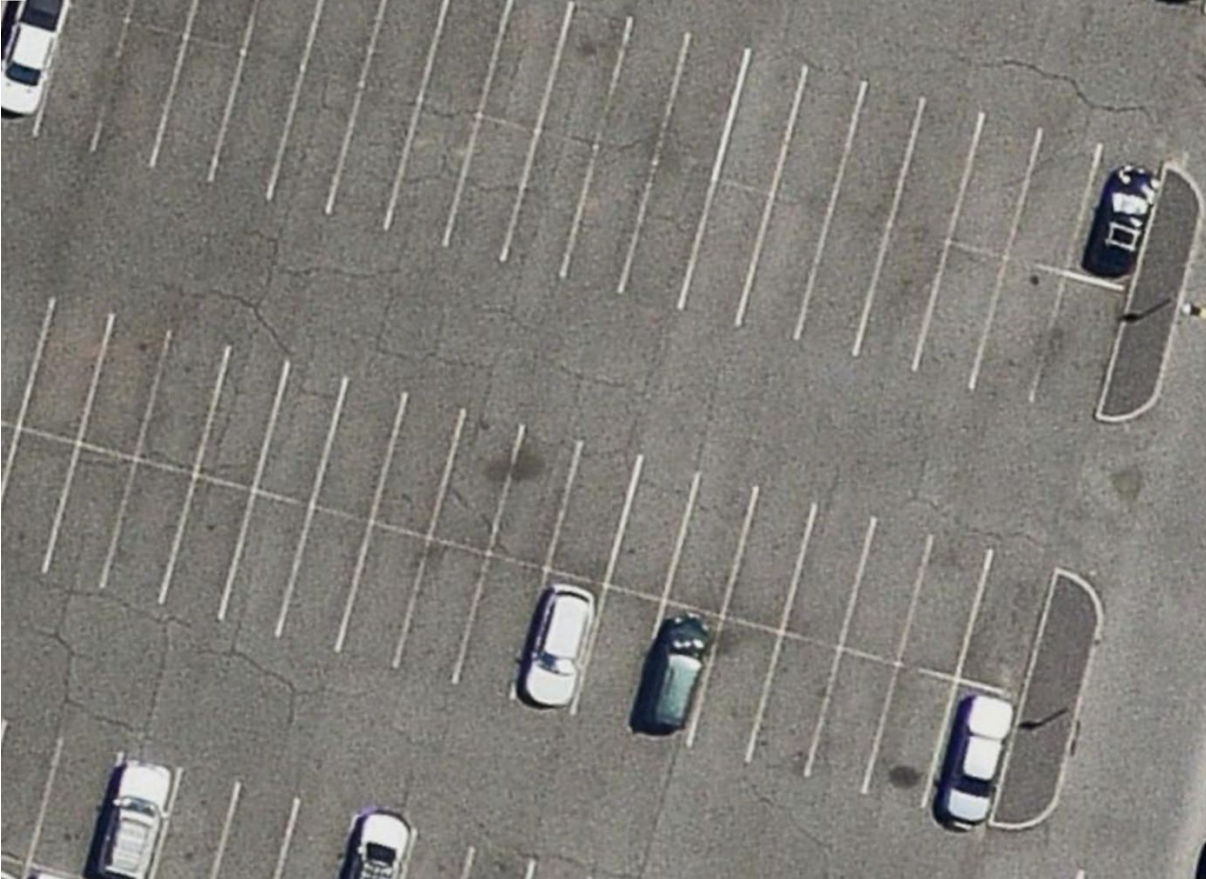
shows an example of a block cracking pattern on a low traffic residential street. Figure 9 shows an example of block cracking within a public car park. Both block cracked pavements are considered suitable for use.
